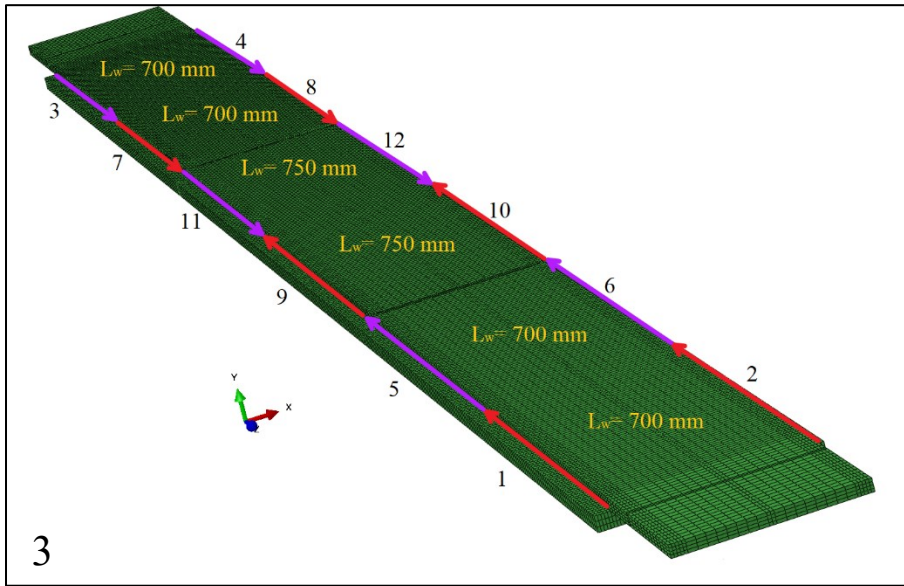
Sequences for welding the reinforcing plate to the bottom flange of steel I-beam
